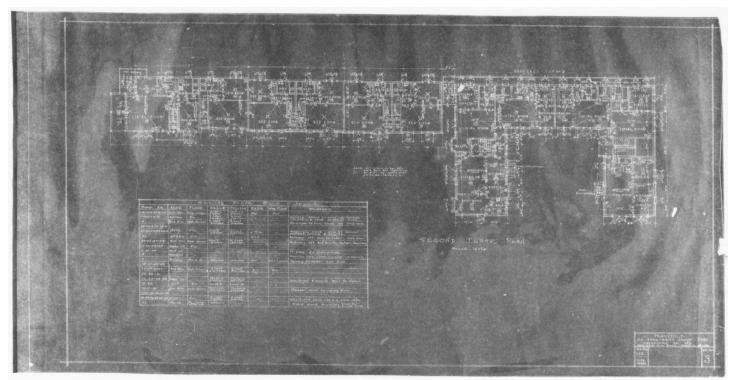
Beauville, Second Floor Plan – 1928 (3 of 7)
